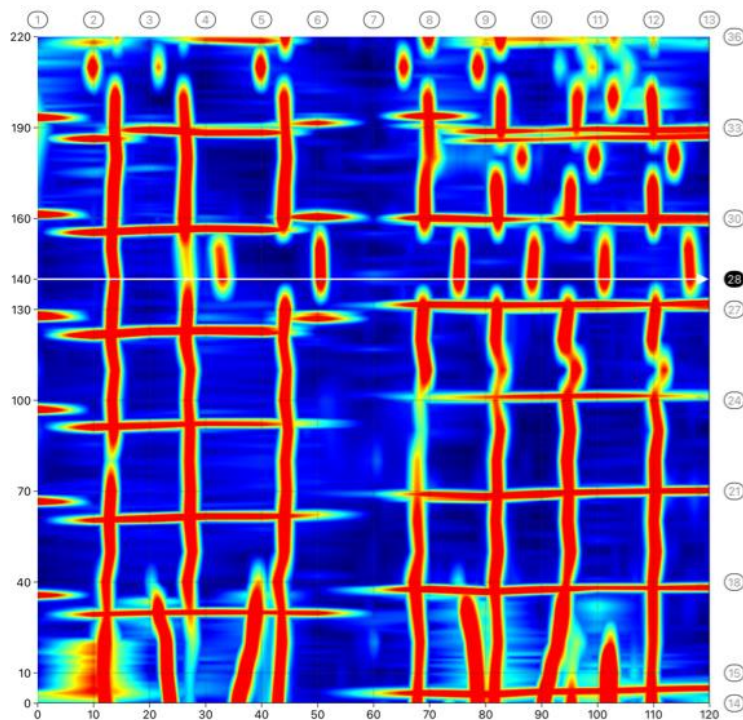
Sample of GPR Scan results for a precast cross wall in John Cozens
